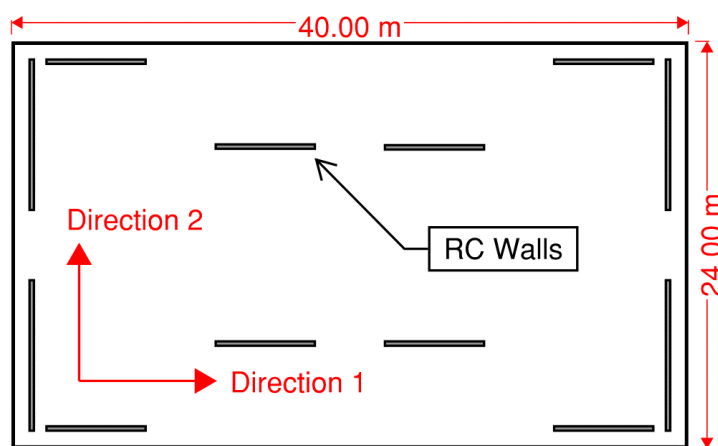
Plan view of case study RC wall building (number of walls varies according to the design).
